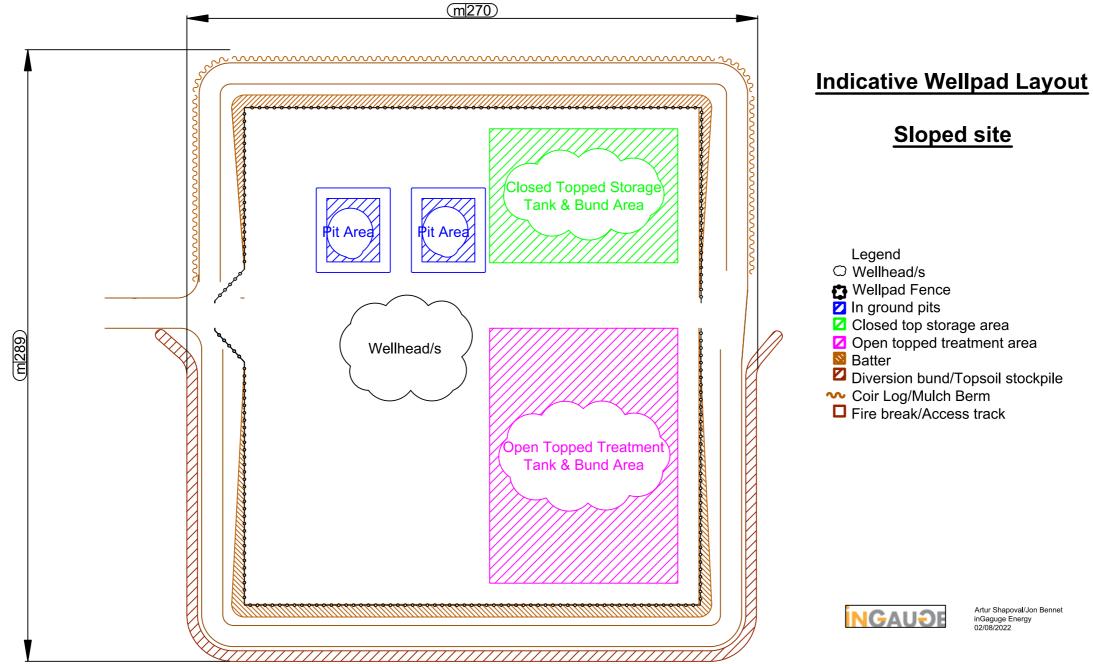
2 Multi-well Well Pad Footprint (and indicative tanks layout, where cut and fill is required)
